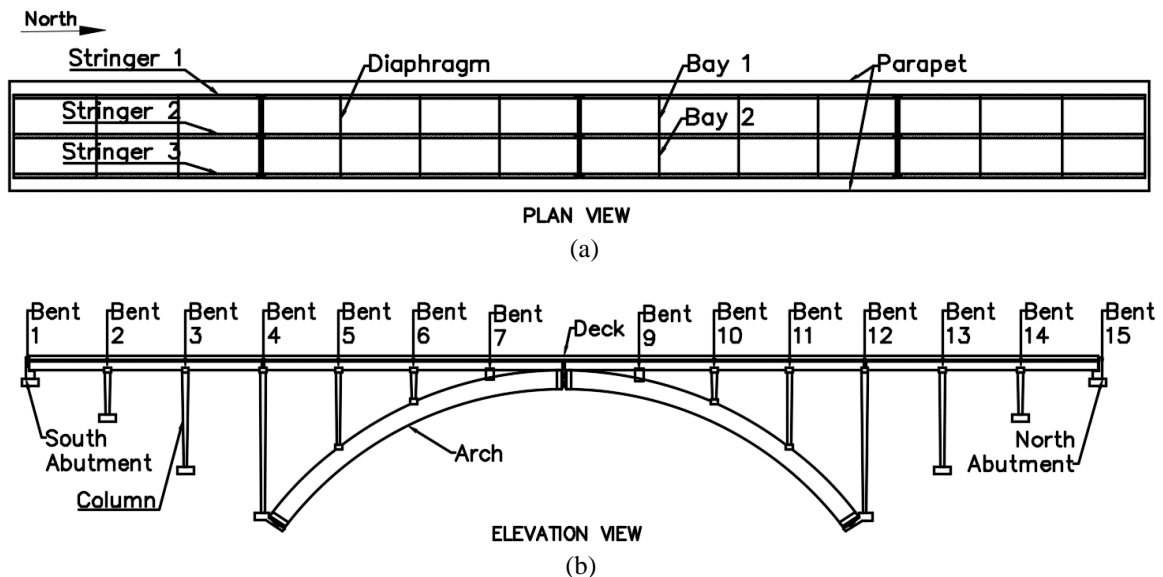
Keystone Wye Bridge with structural component numbering: (a) component numbering on plan view and (b) component numbering on elevation view.
